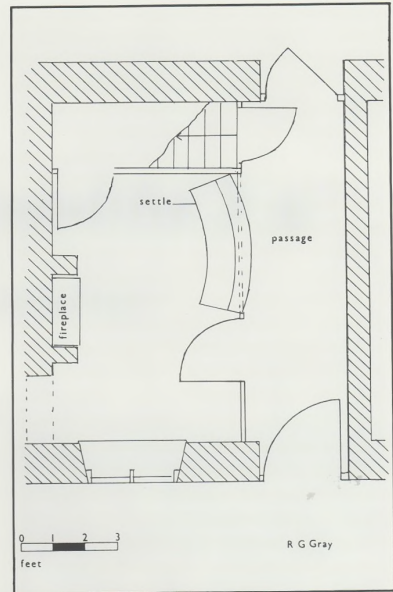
Plan of cottage at Dancing Cross, Wincanton, Somerset.
